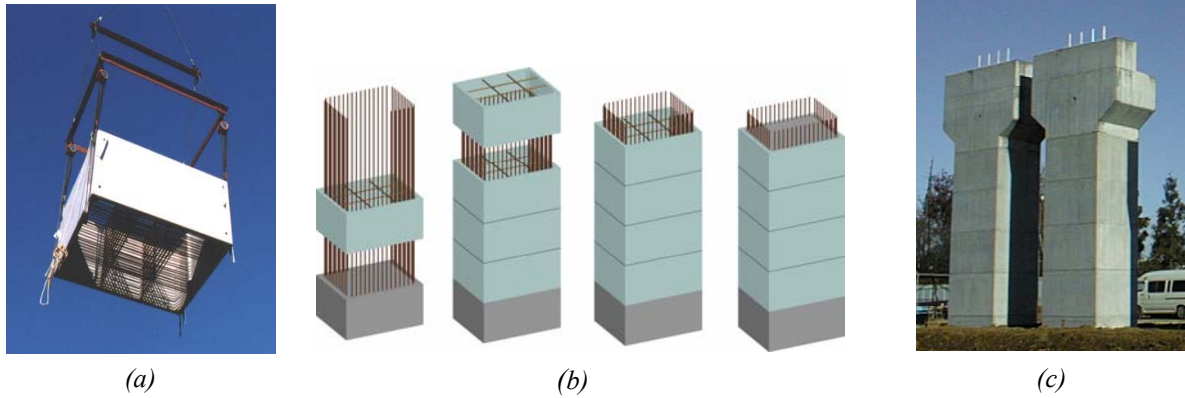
Partially-Precast Segmental Pier System for Solid Columns: (a) Exterior Precast Panels; (b) Construction Sequence; (c) Completed Piers. (Courtesy of Sumitomo Mitsui Construction Co.)
